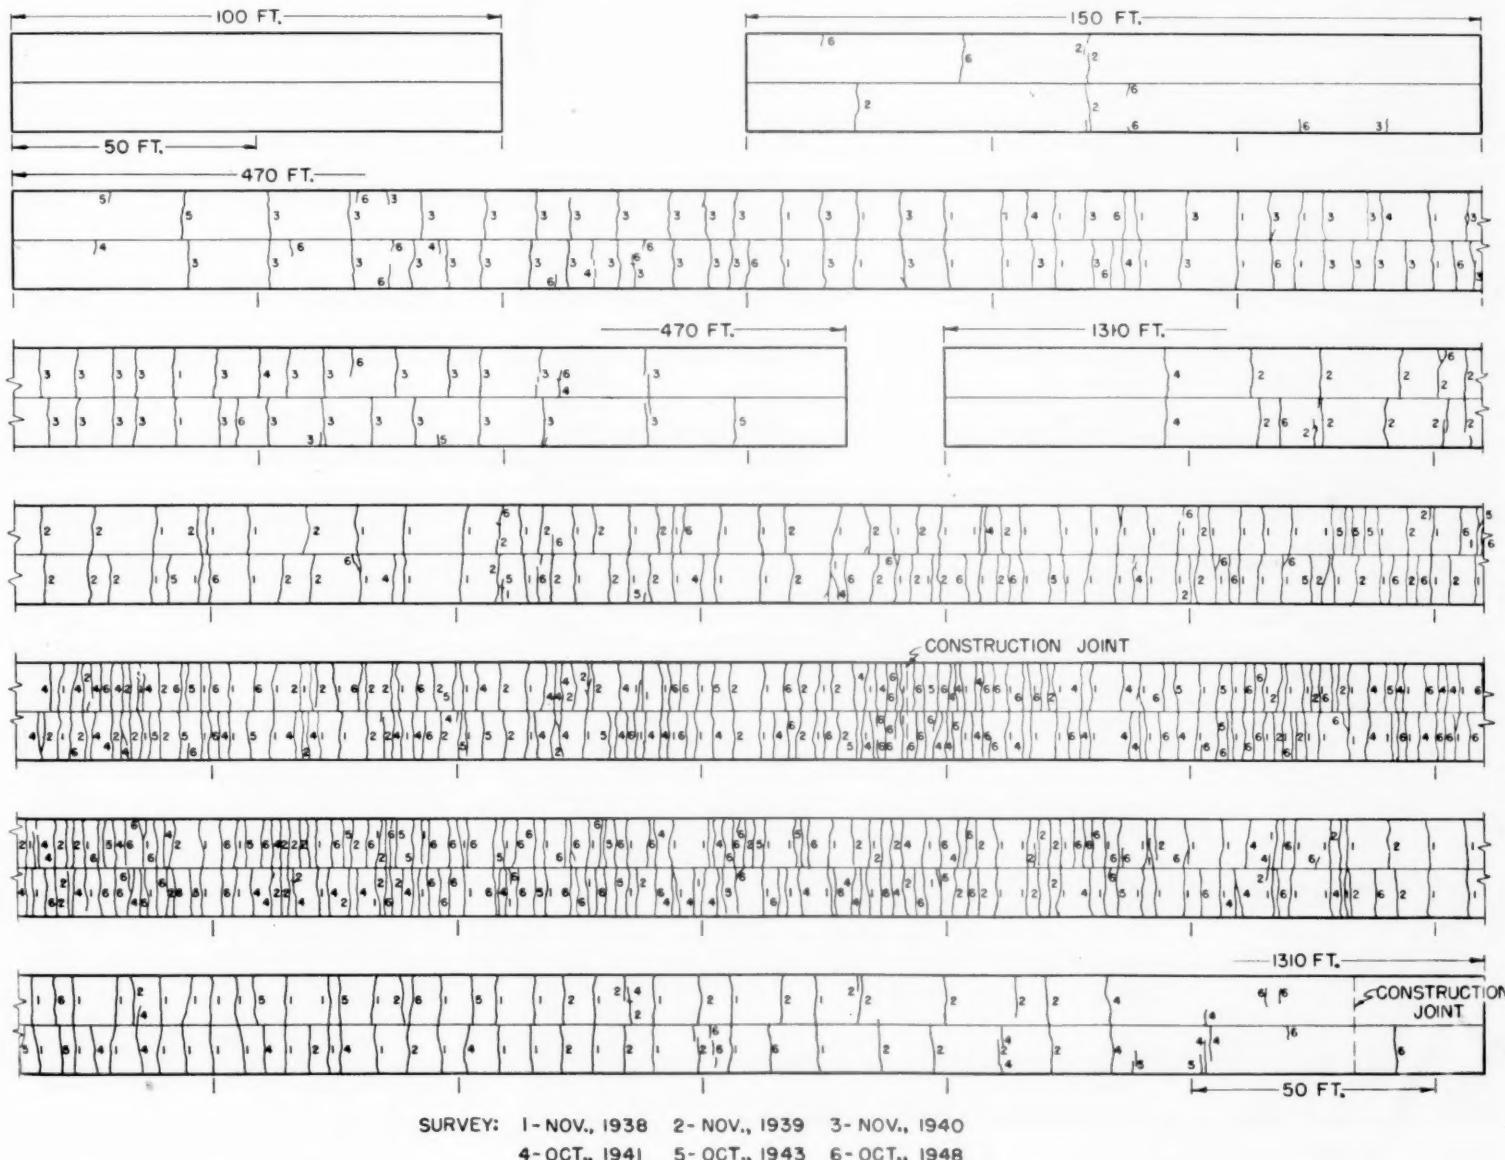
Typical formation of cracks during the first 10 years of pavement life (sections placed September–October 1938).
